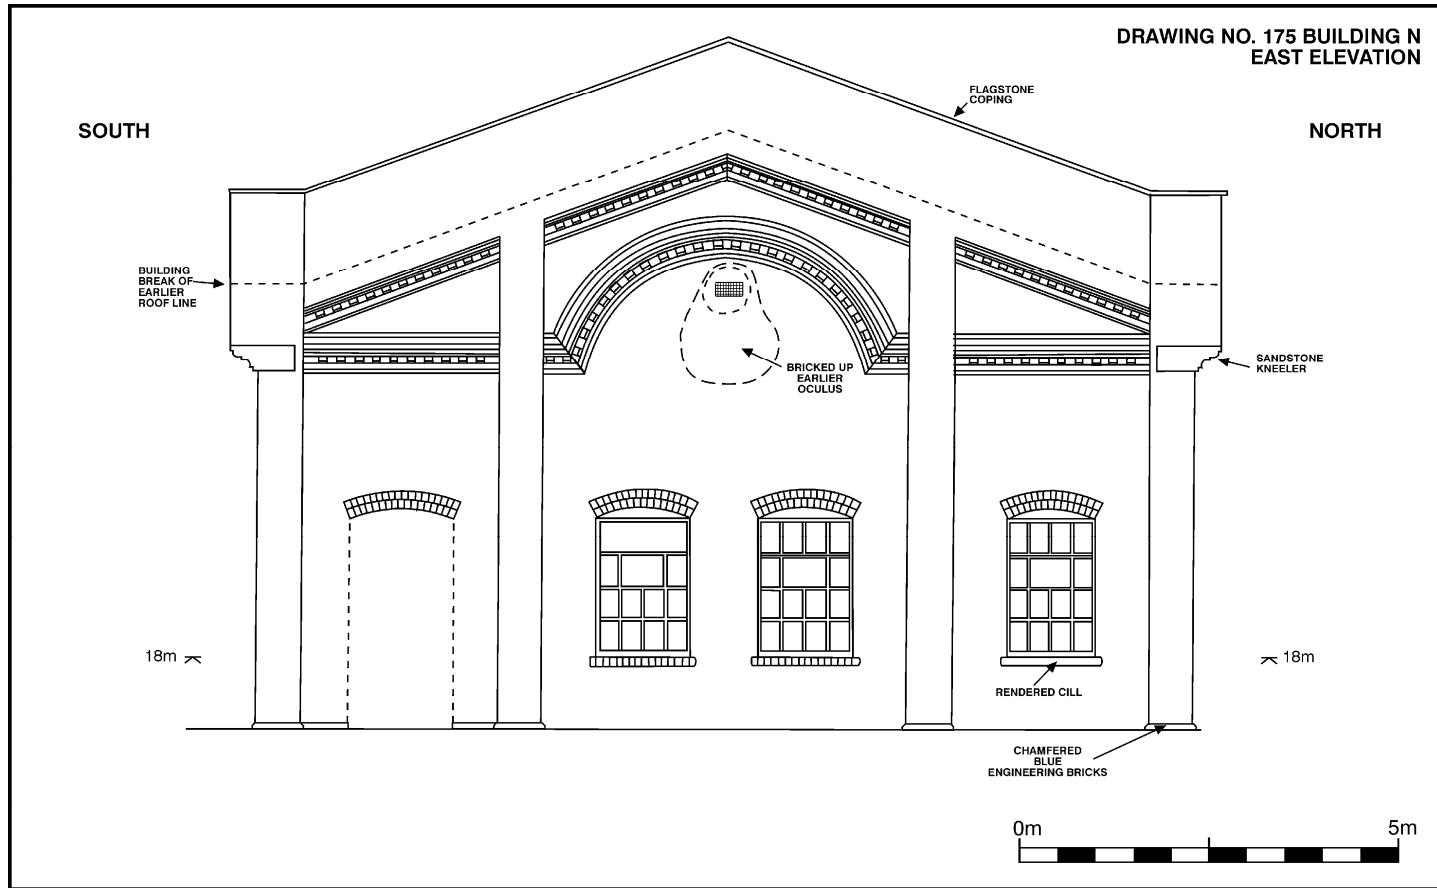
Survey drawing of the east elevation of Building N (scale 1:100)
